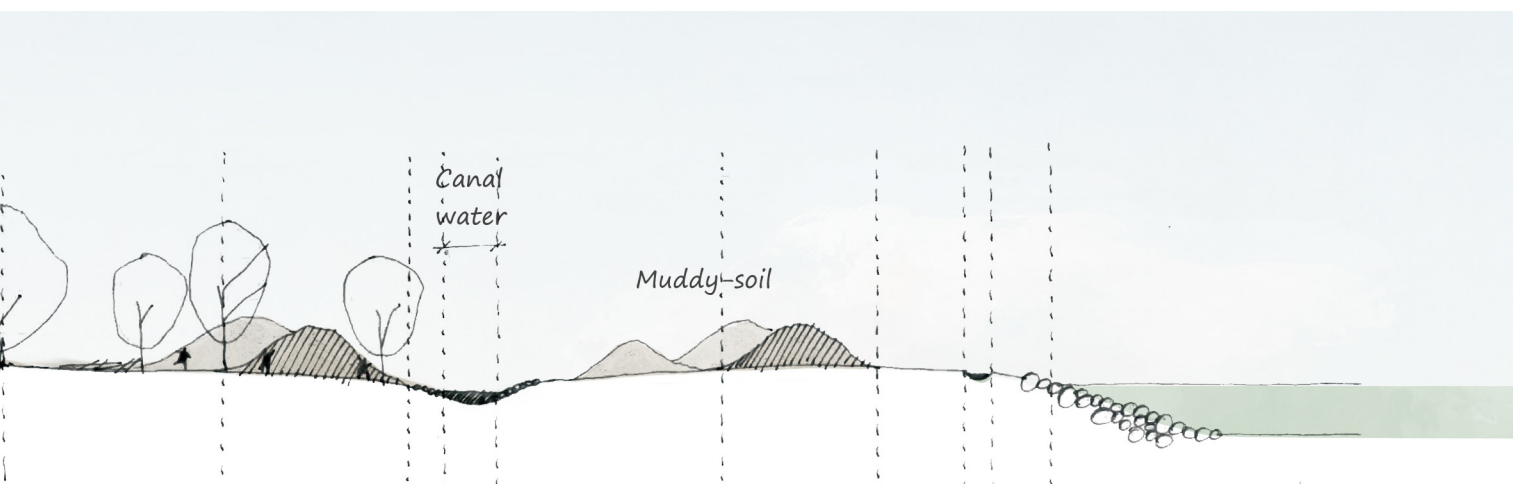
Sketch of "construction site"- sand piles, mud, water
